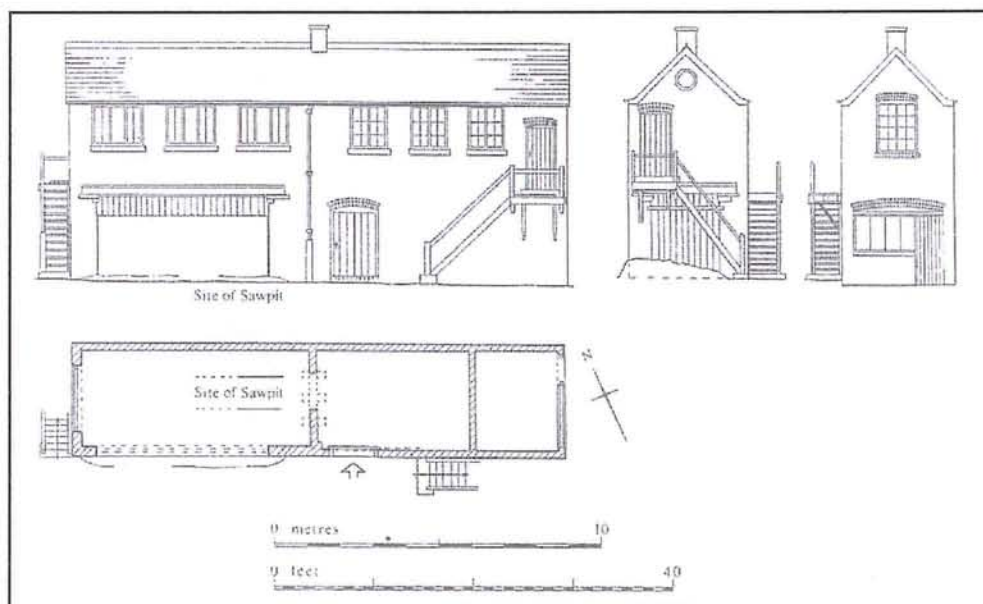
Plan and elevations of the saw shed (after Hughes 1988, Fig. 99)
